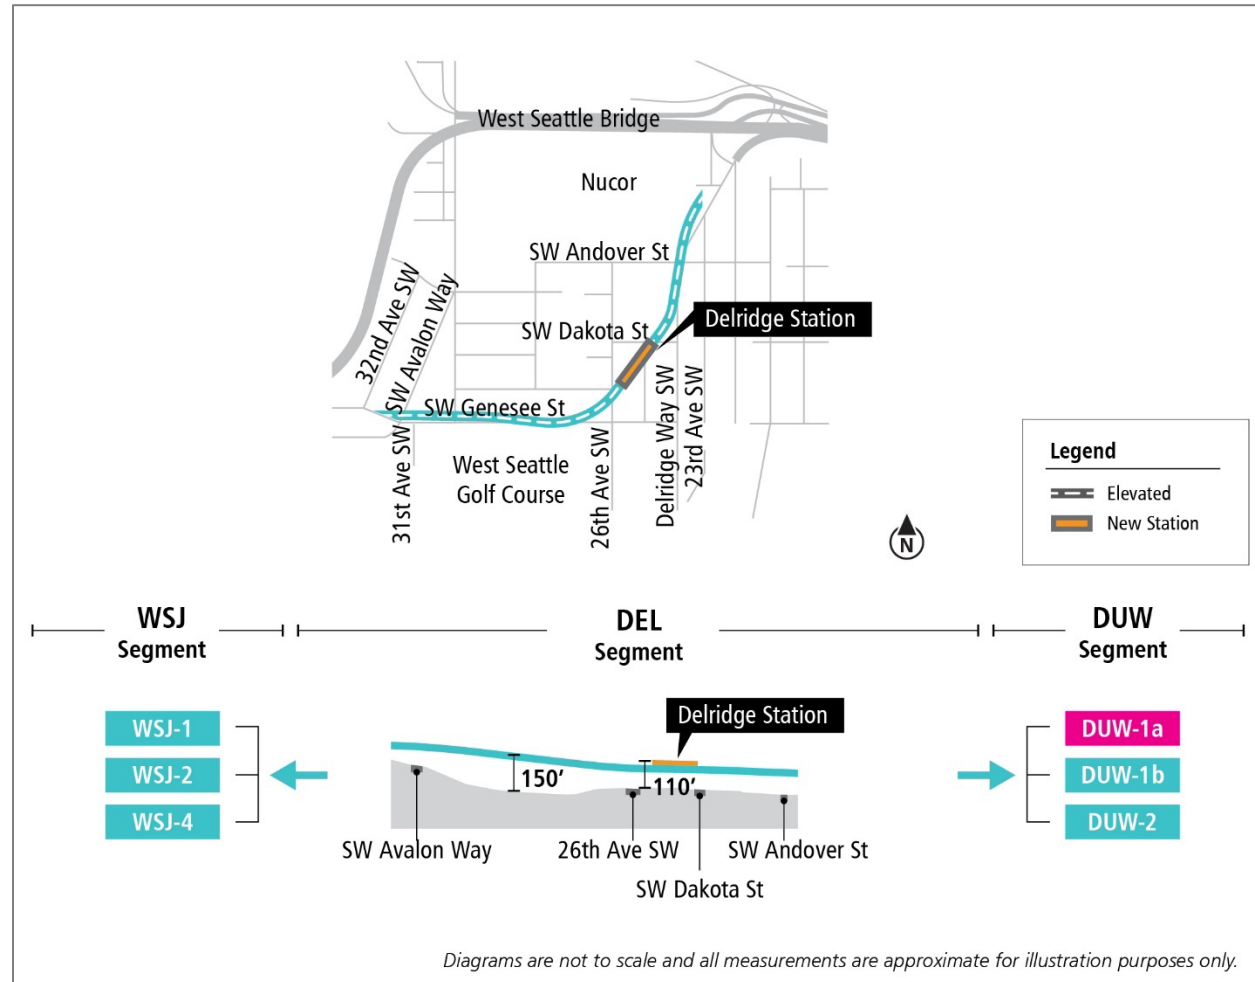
Plan and Profile for Dakota Street Station Alternative (DEL-1a)
